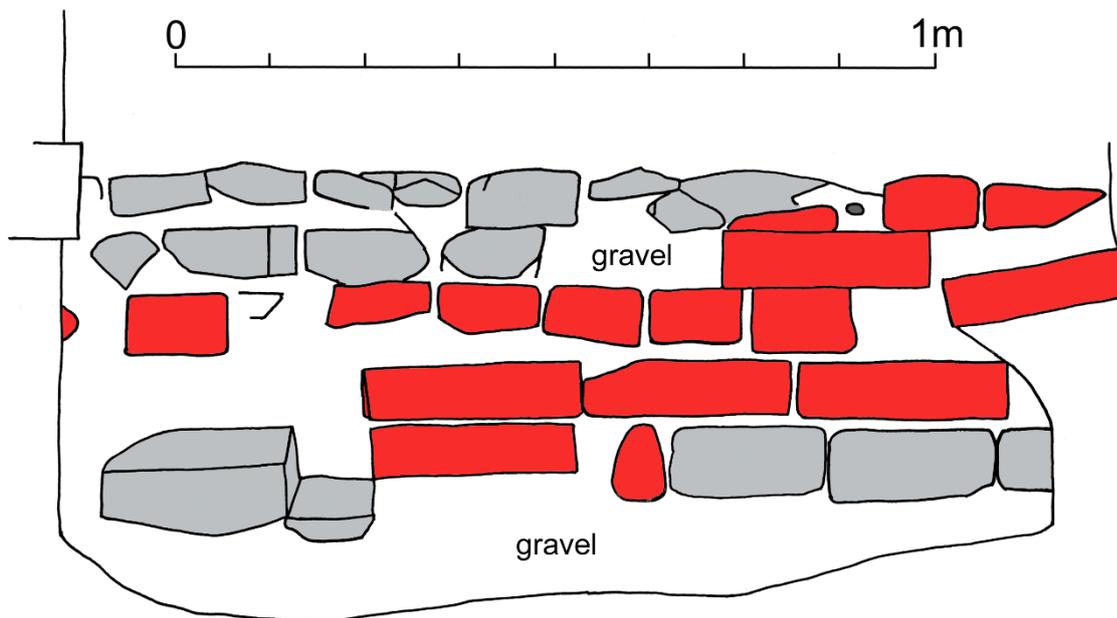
The north face of the retaining [CU15] on the south side of the channel. Red=brick, light grey=chalk, dark grey=flint.
